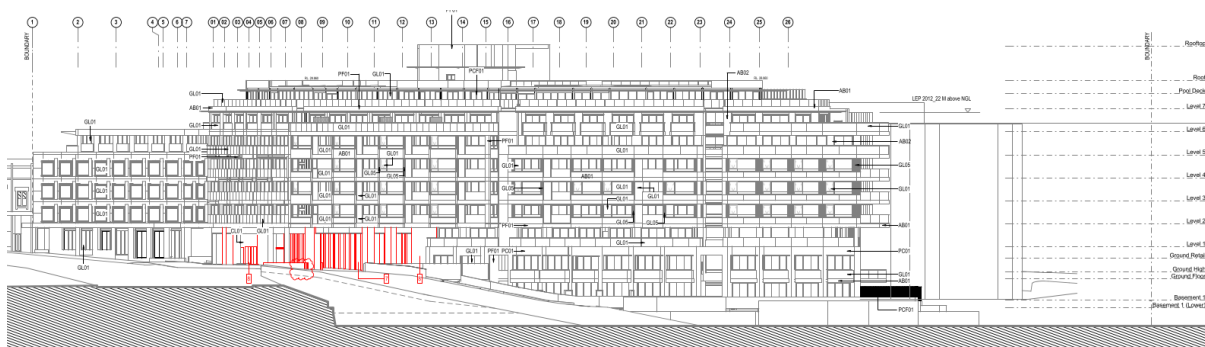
Proposed Southeast Elevation (with lobby glazing modifications shown in red)
